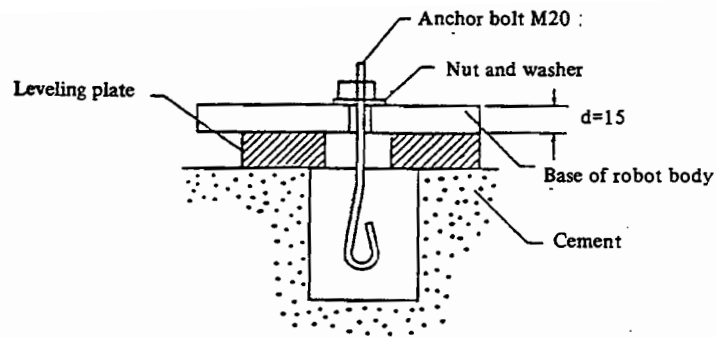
(c) Foundation installation drawing (S-10)
